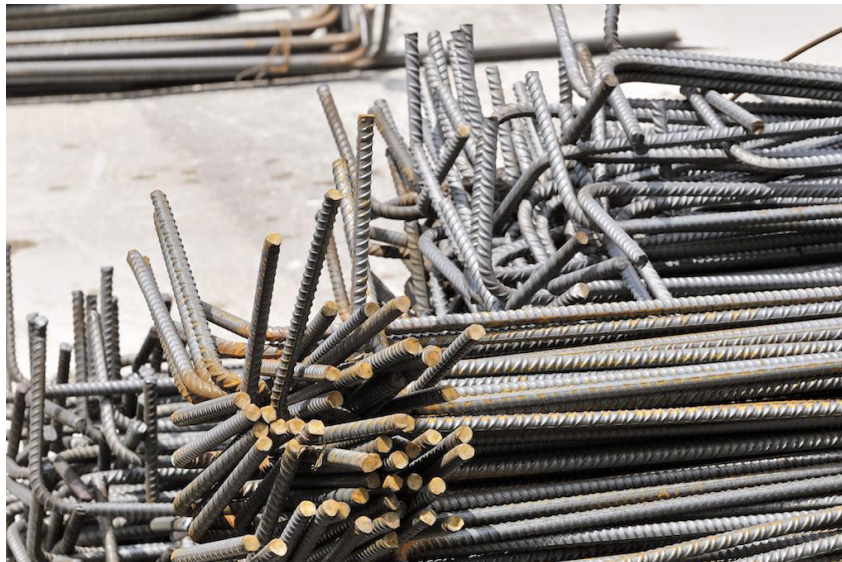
Cutting and bending a reinforcement bar (rebar)
